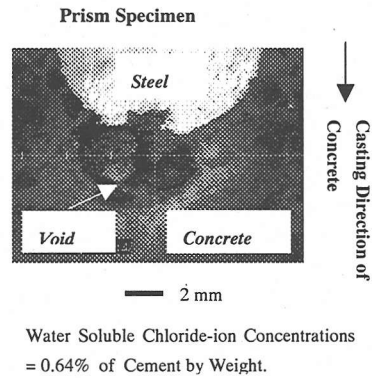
Pit on the Steel Bar due to the Void (Prism Specimen – OPC)
